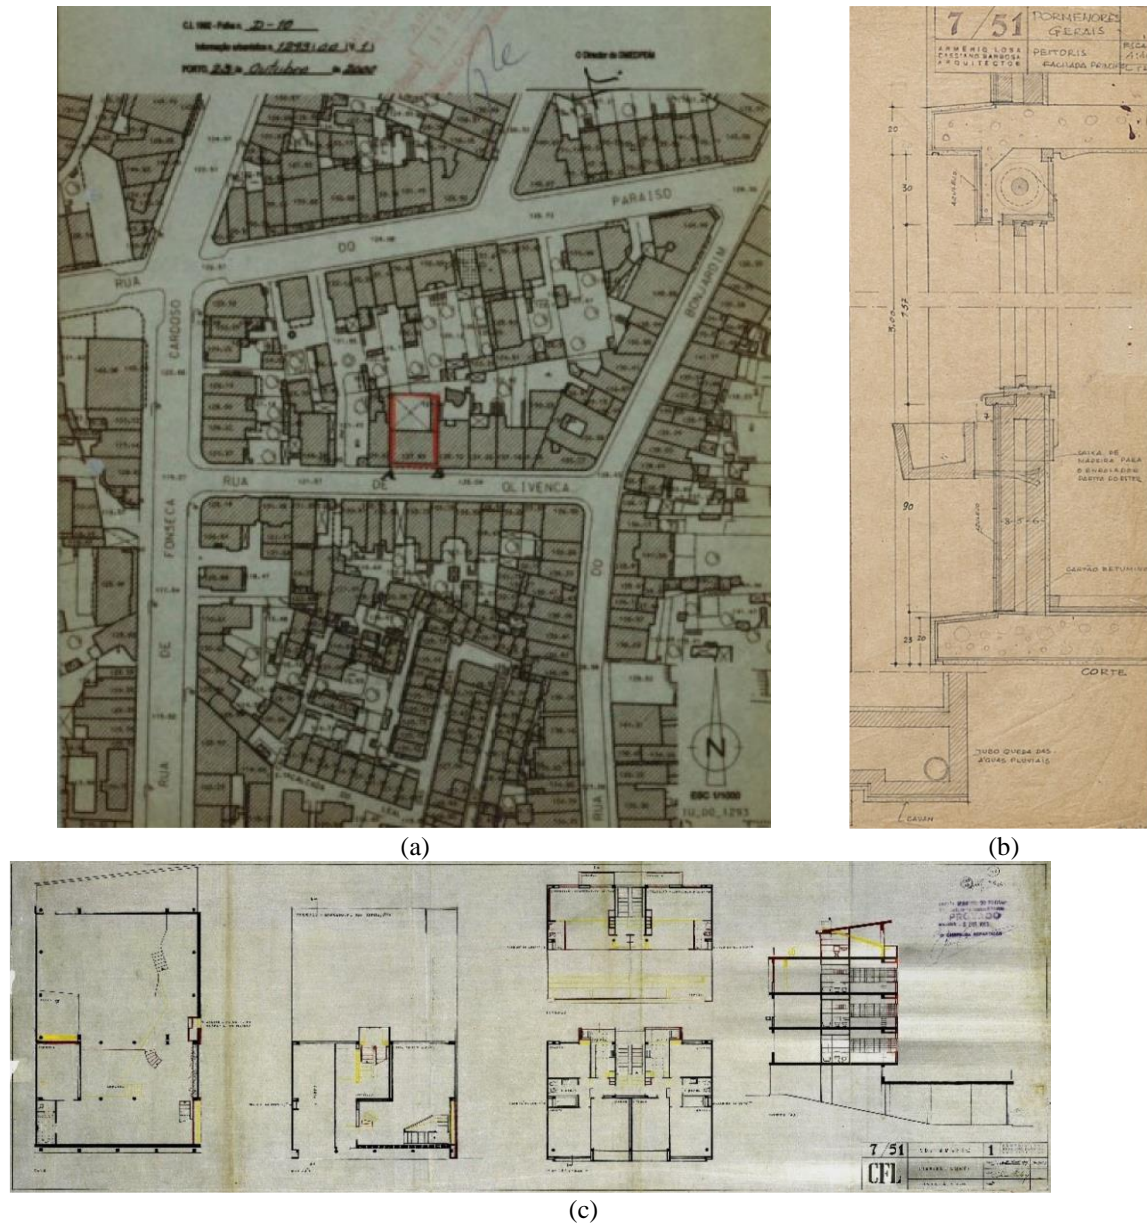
Edifício Lino, Implantation (a), detail of façade section (b) plans and section drawings (c) from the construction period (1951-1954). Adapted from [9].
